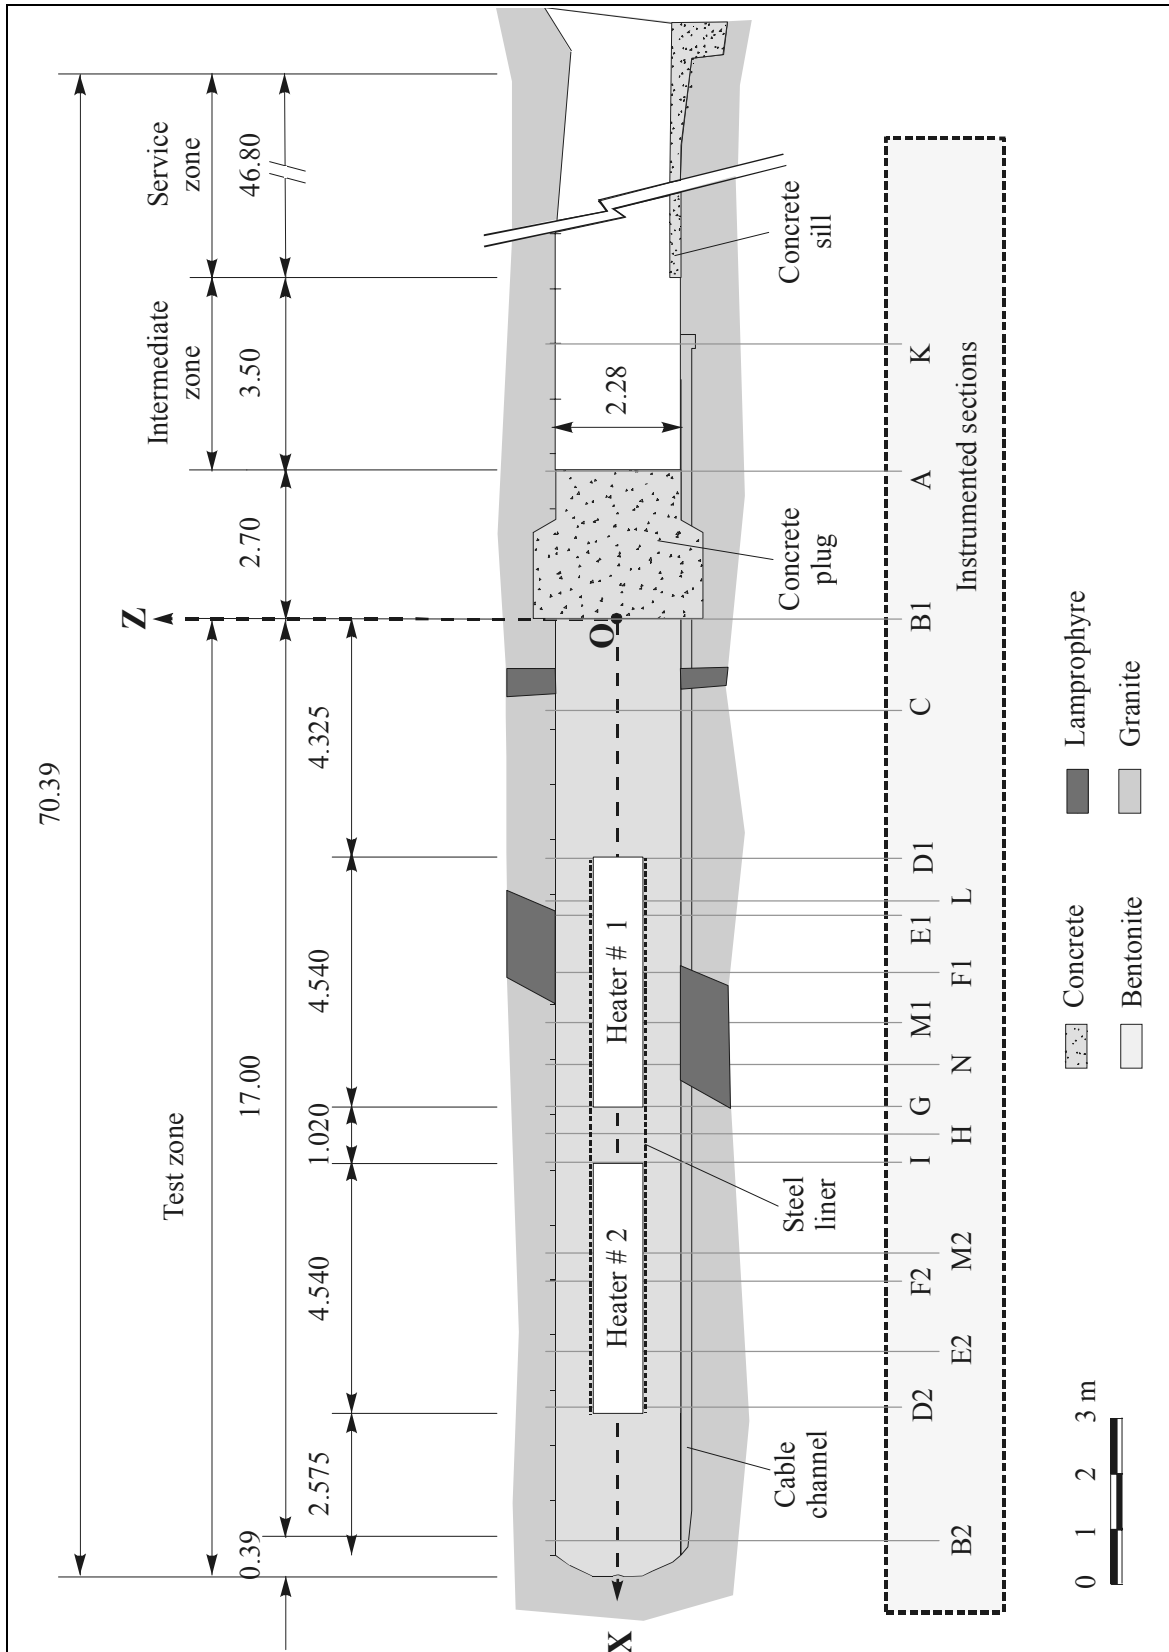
Test site with dimensions and measuring sections /2-1/.
